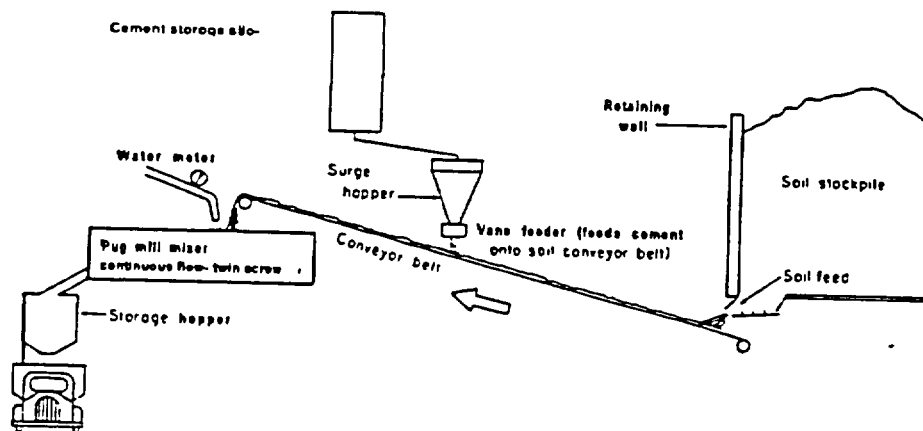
Diagram of continuous-flow central plant for mixing soil cement
